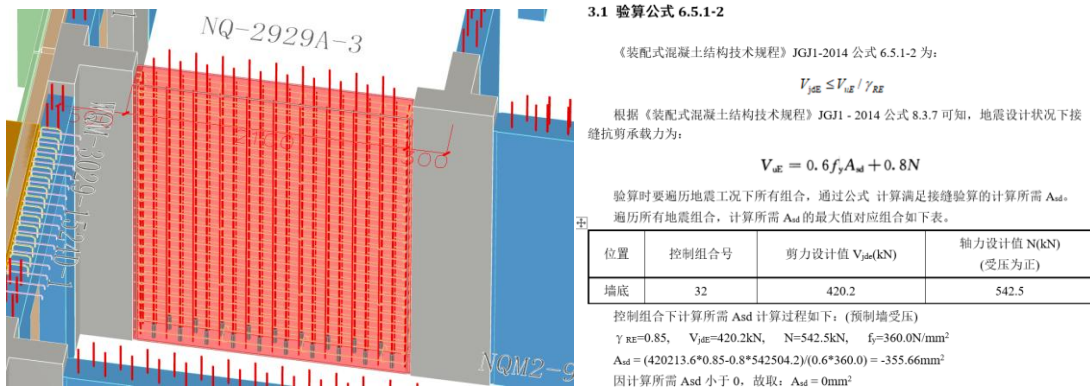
Some result content of the prefabricated wall horizontal joints calculation in YJK's built-in prefabricated building design software
